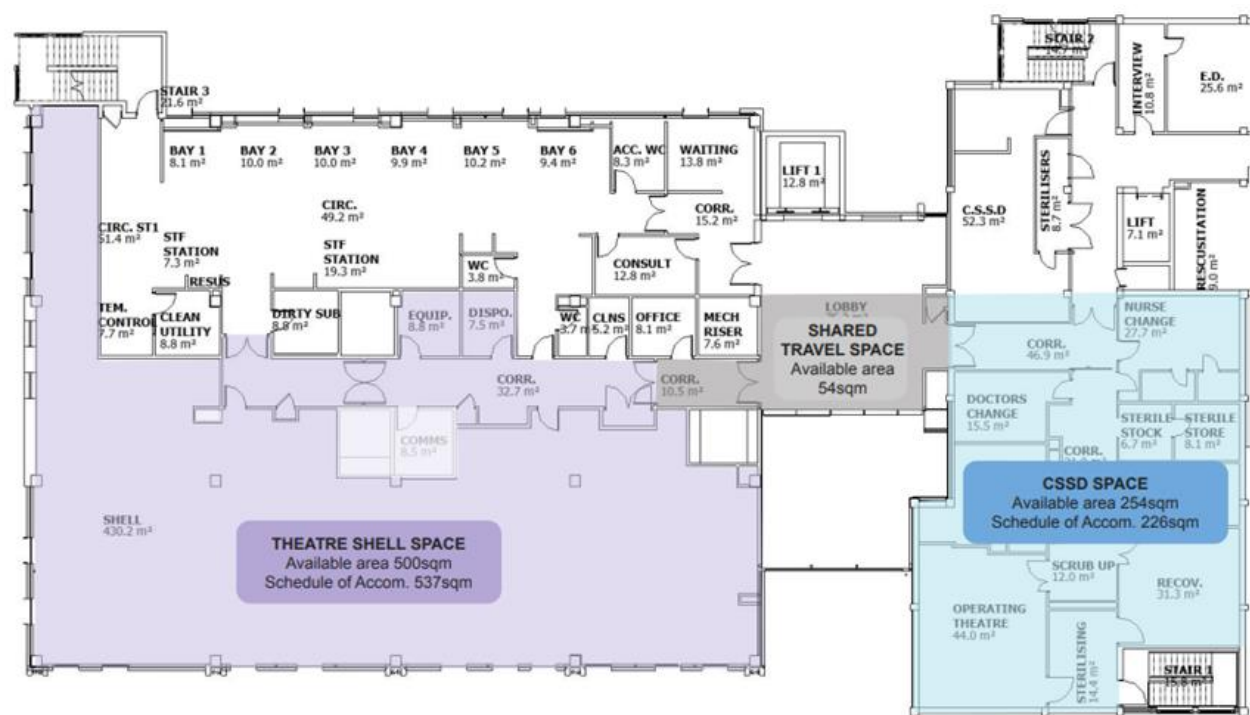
Level 1 Main Building and Stage 2 Building – location of the proposed works (dwp)
